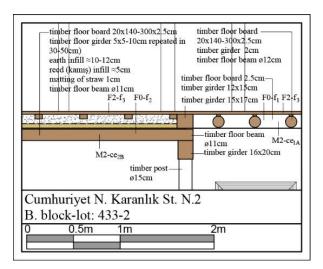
Drawing of timber flooring Type 1 and Type 2 (Cumhuriyet N. b.block-lot:433-2)
